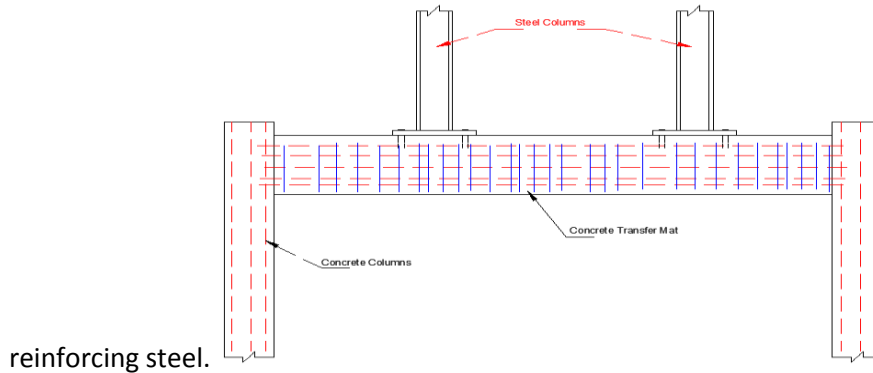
shows an example of a concrete mat used to carry loads from two steel columns.
